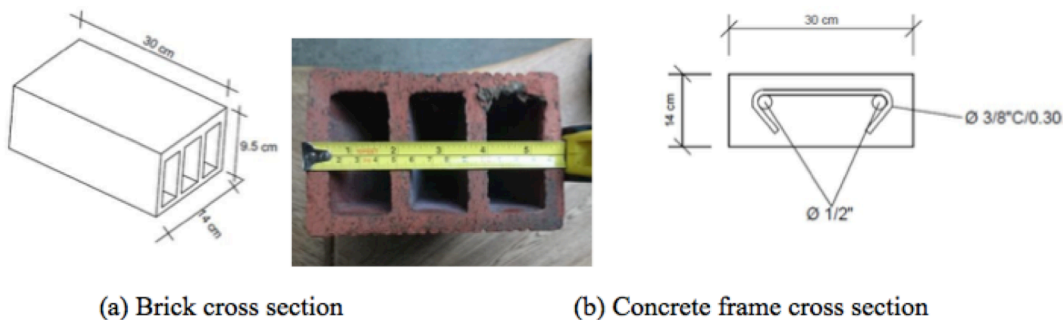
Masonry and concrete frame dimensions and reinforcement.
